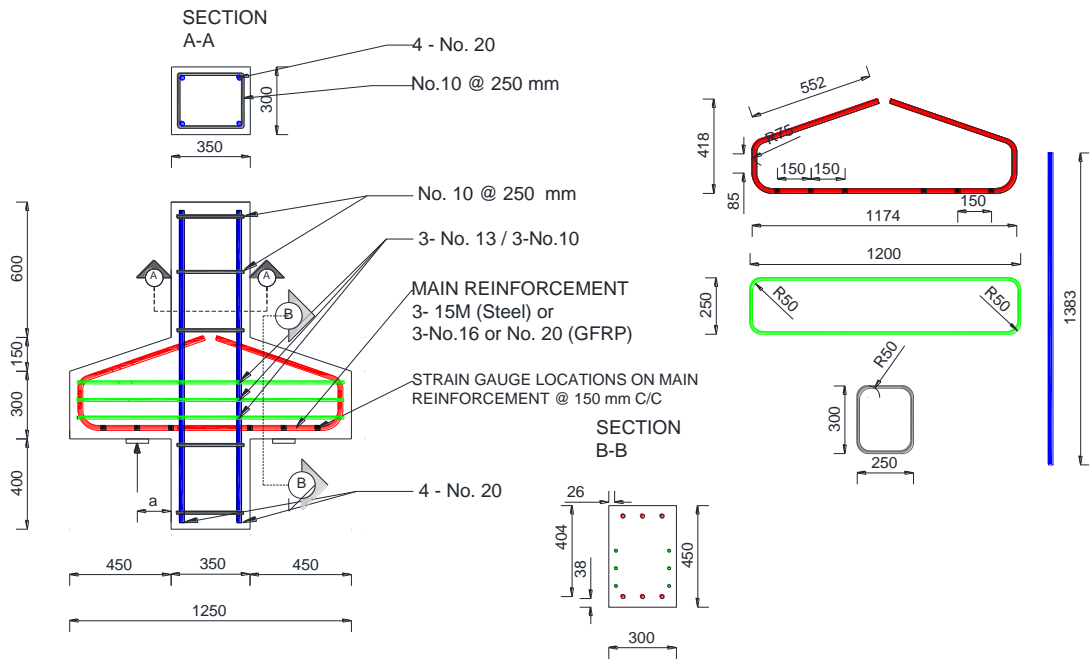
Geometry and Reinforcement details for corbels with crack-control reinforcement.
